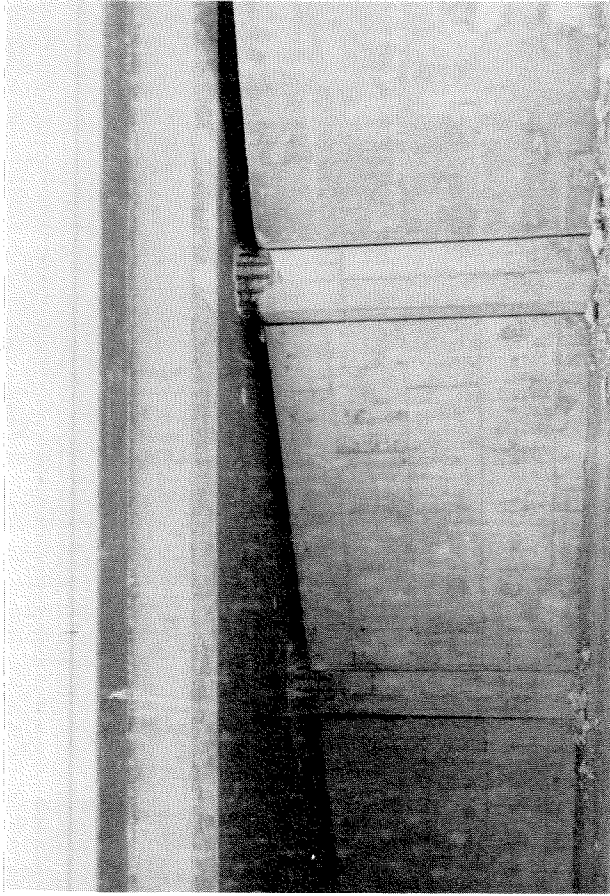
Column damage at tops of retaining walls, Foothill Boulevard undercrossing, Foothill freeway.
